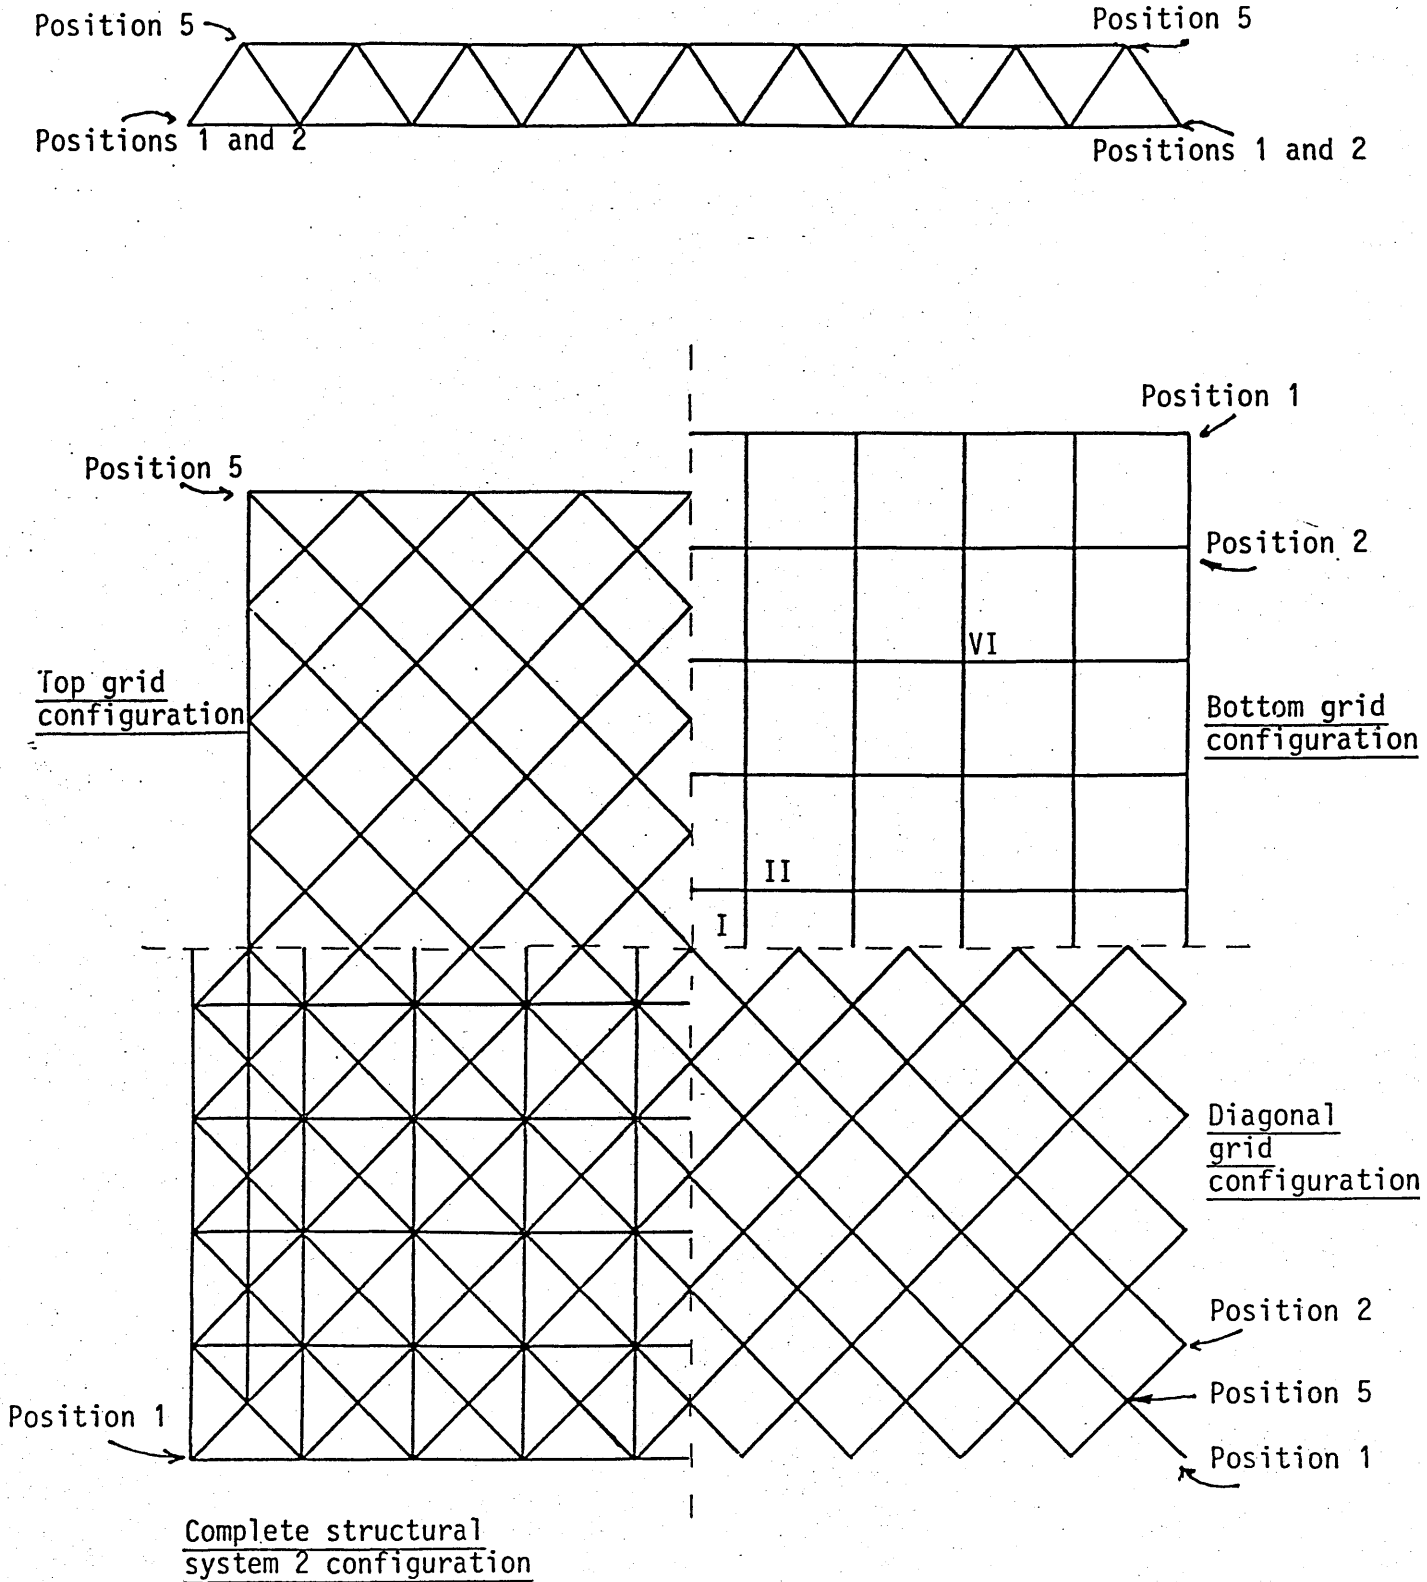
Skeletal Structural System 2. Plan showing the separate layer configurations
